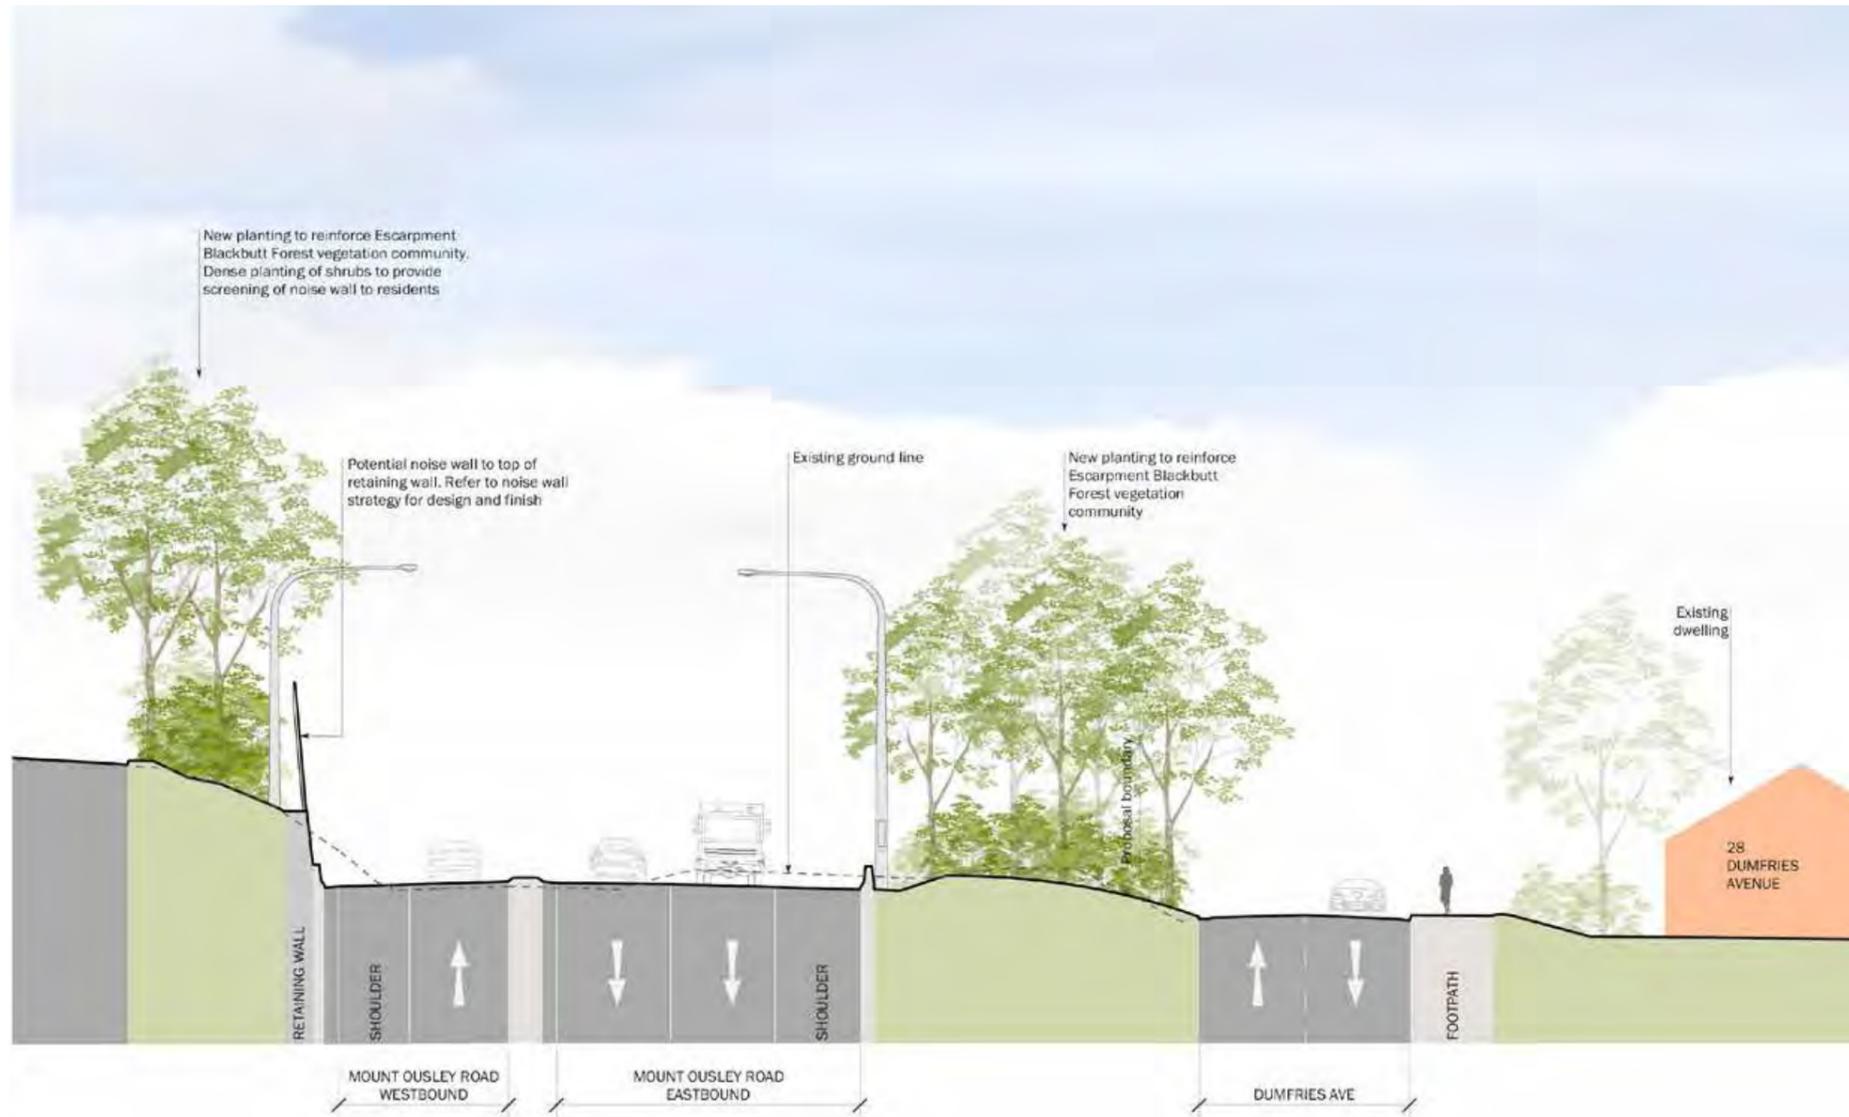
Section 4 through Mount Ousley Road - Chainage 1120 (Scale 1:250)
